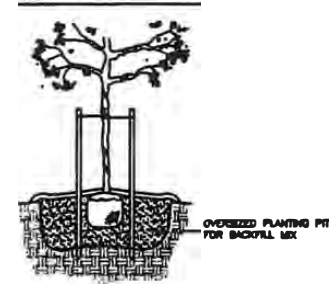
CONCEPTUAL LANDSCAPE BERM PLANTING PLAN
